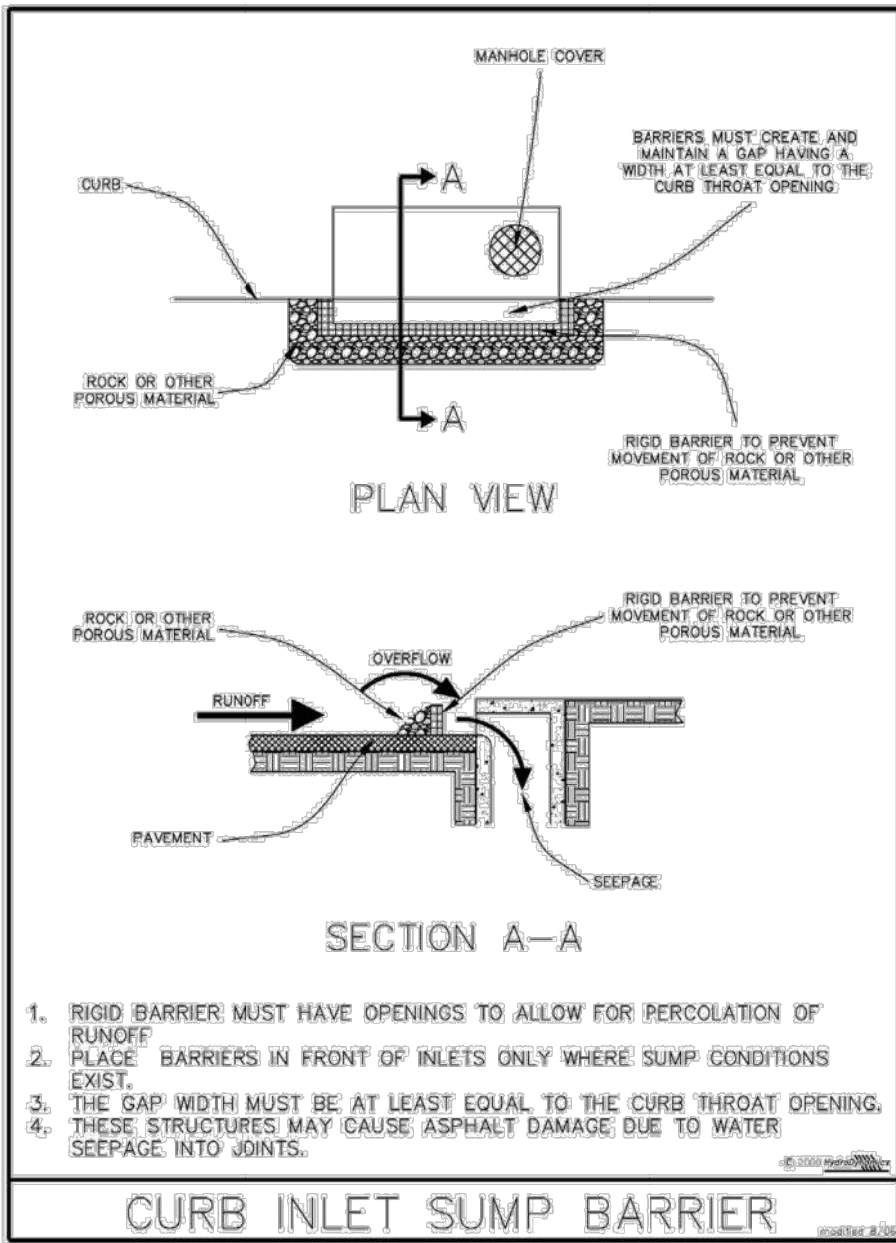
Illustration of a Curb Inlet “Sump” Barrier
